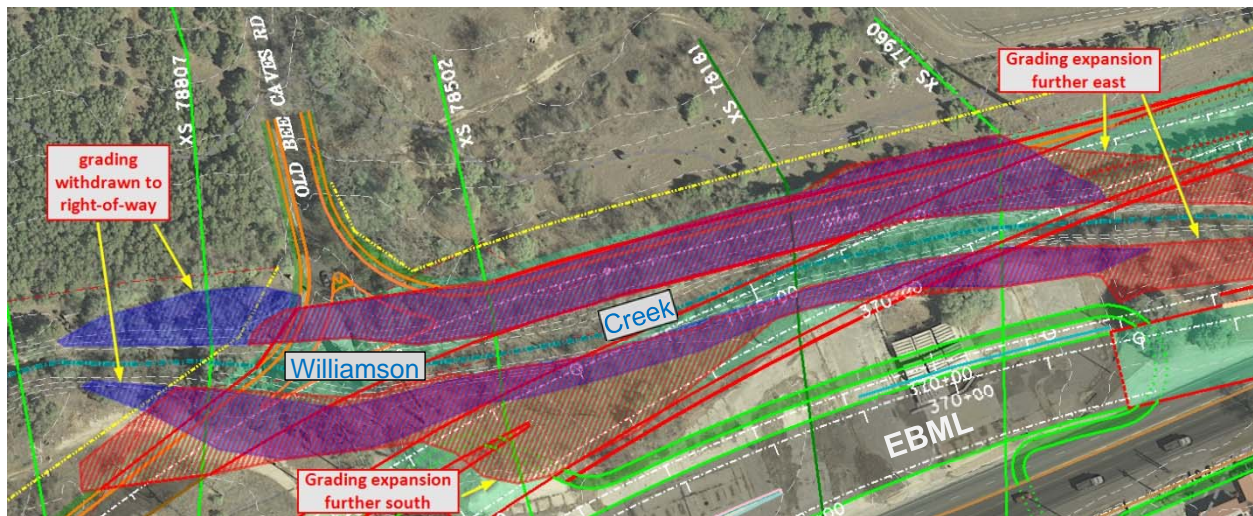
Grading Modifications near Old Bee Caves Bridge and WBML Flyover
